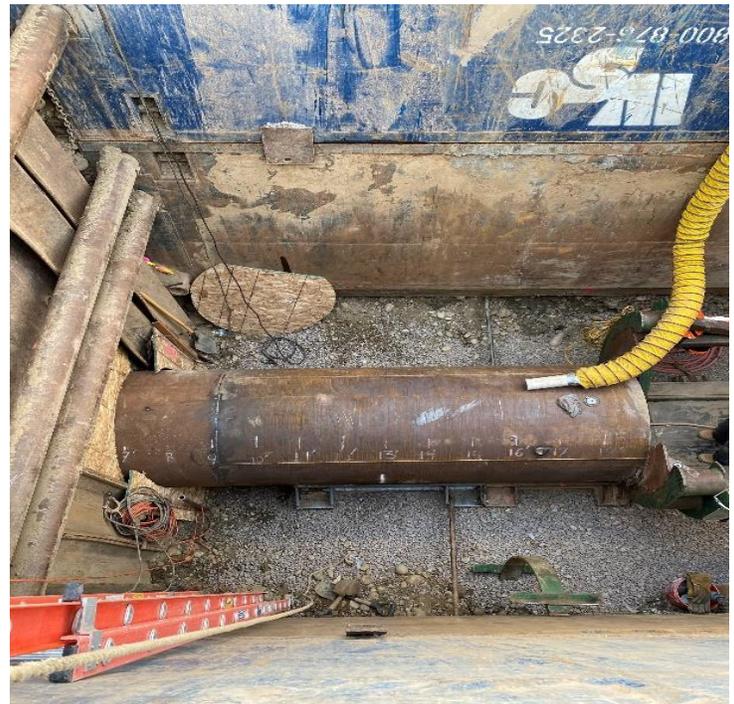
Boring under Denver Water Conduit No. 16 for Sanitary Sewer Main
